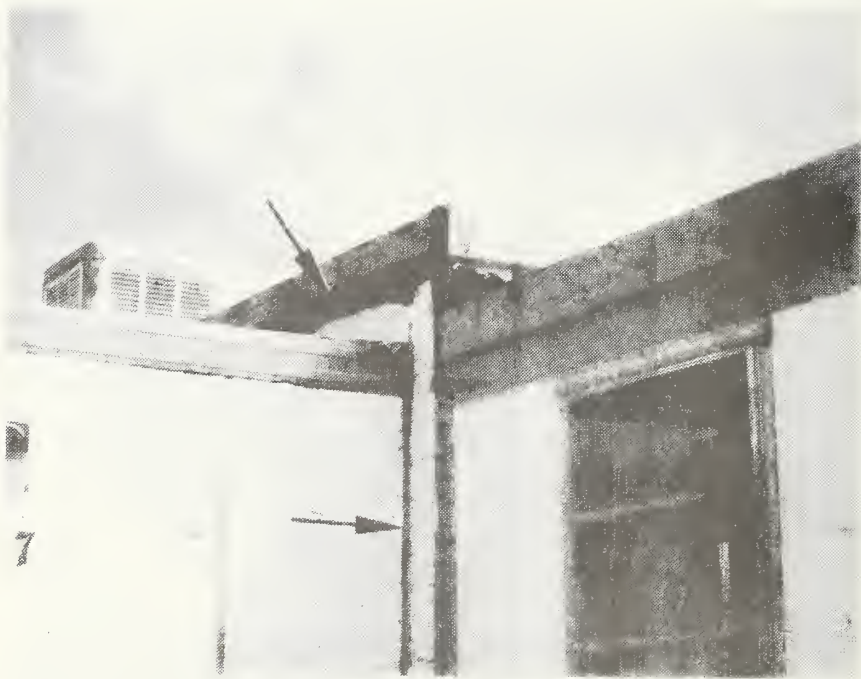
Application of Coating Material to Repair Water Leak at Tip-out Joint
